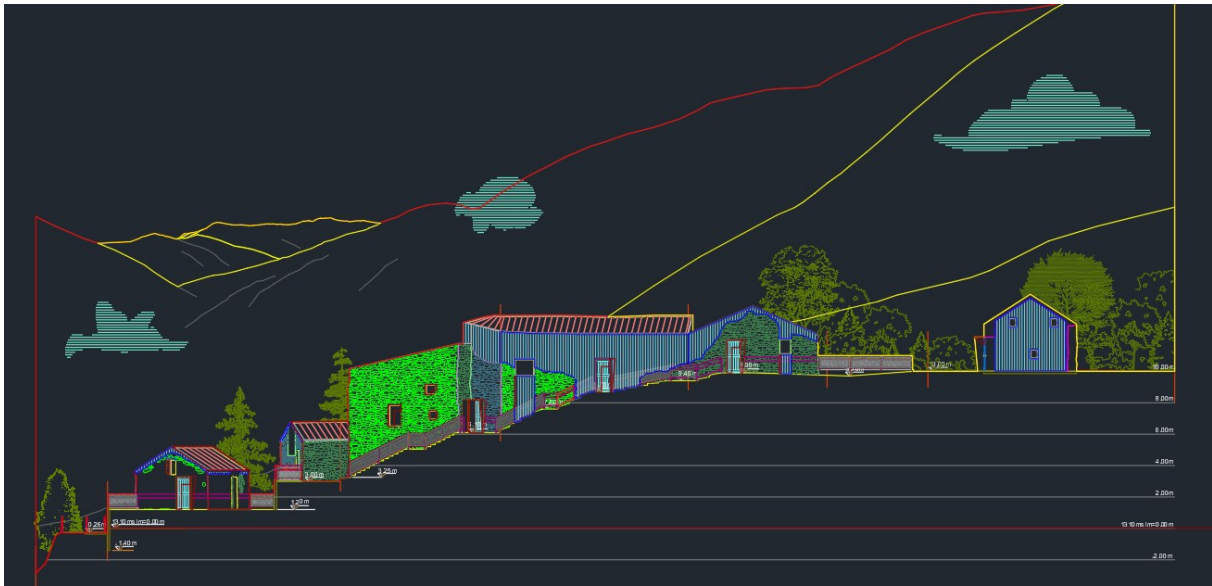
Section of the town in Autocad (architectural design by A. Craveri and C. Dallere)
